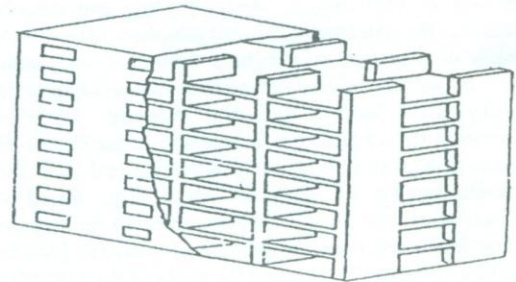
Perspective view of Shear Wall building showing transverse critical section
